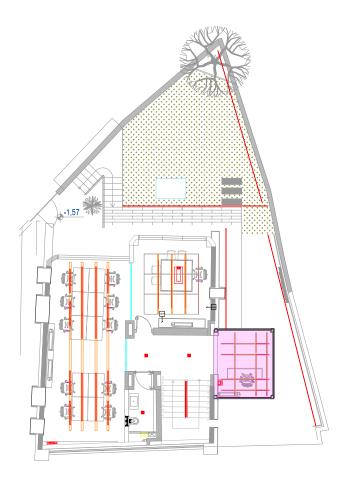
ERKE's Lighting Reception Layout in the Ground Floor
